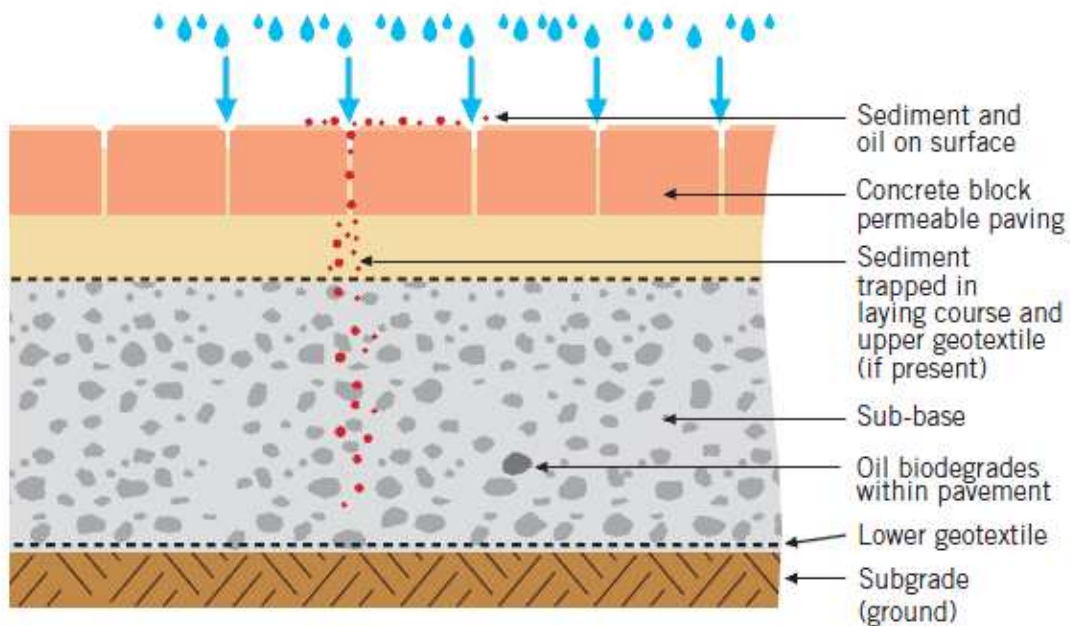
Permeable interlocking concrete pavers section (<http://www.marshalls.co.uk>, 2008)
